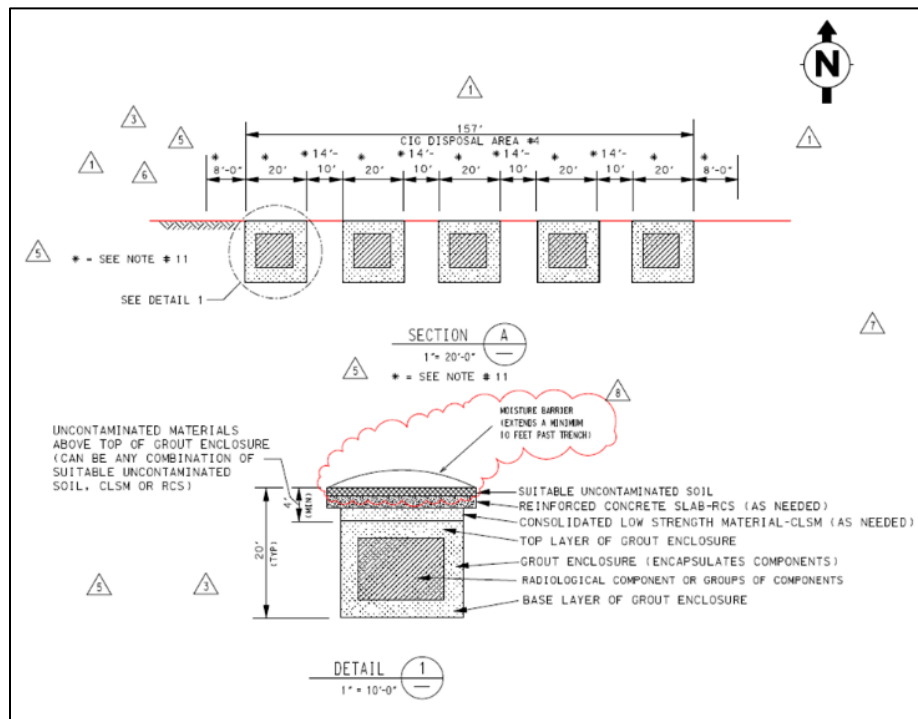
Nominal Cross-Sectional Layout and Design of Components-in-Grout Trench Segments within Slit Trench Footprint (Danielson, 2020c)
